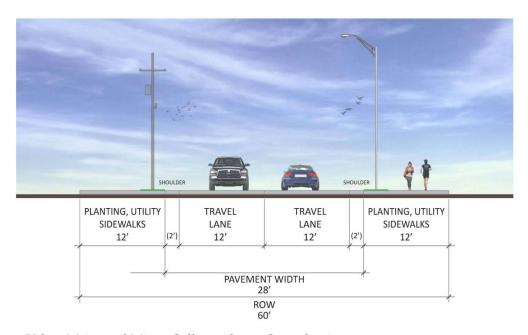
Urban Major and Minor Collector Street Cross-Section
